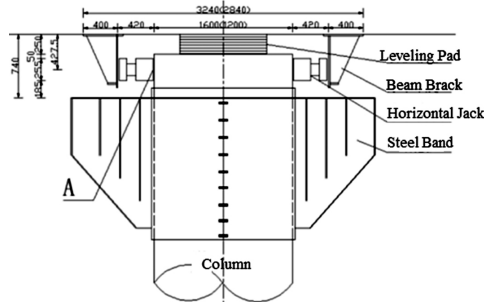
Diagram of horizontal braces and horizontal jack layout
